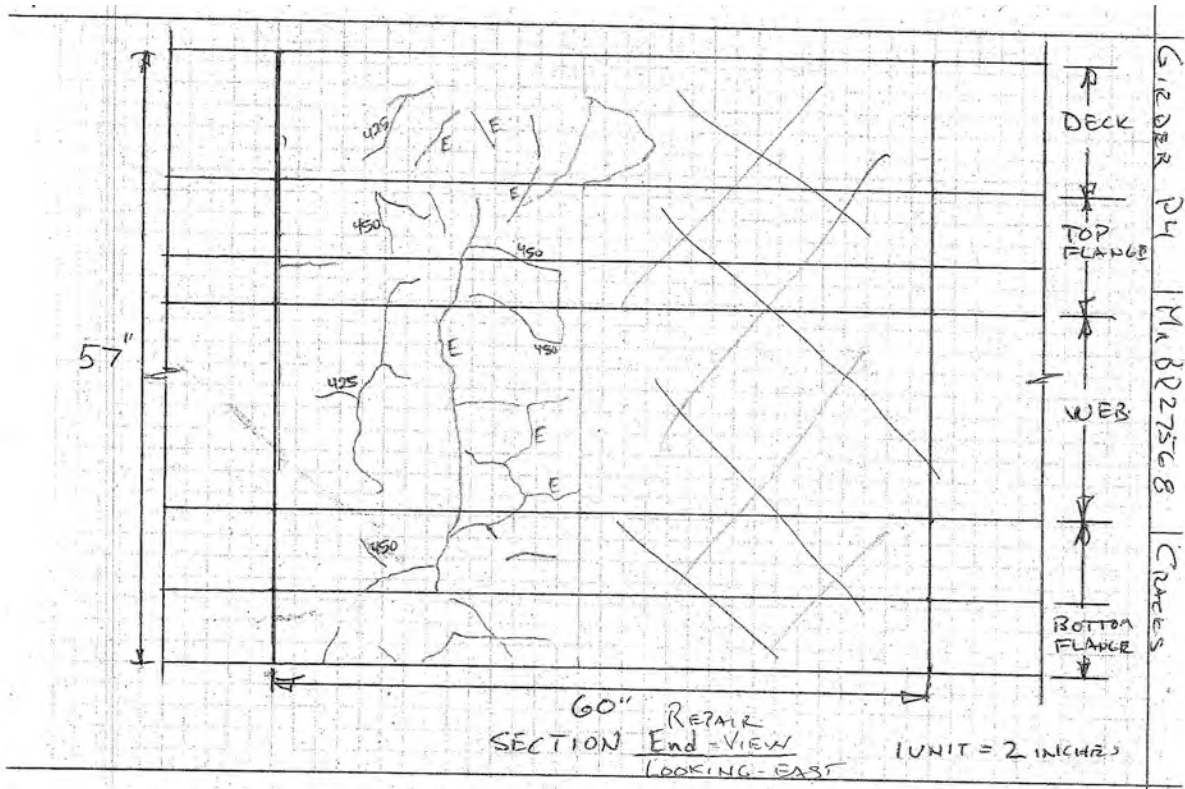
Girder P4 crack pattern – repair end view
